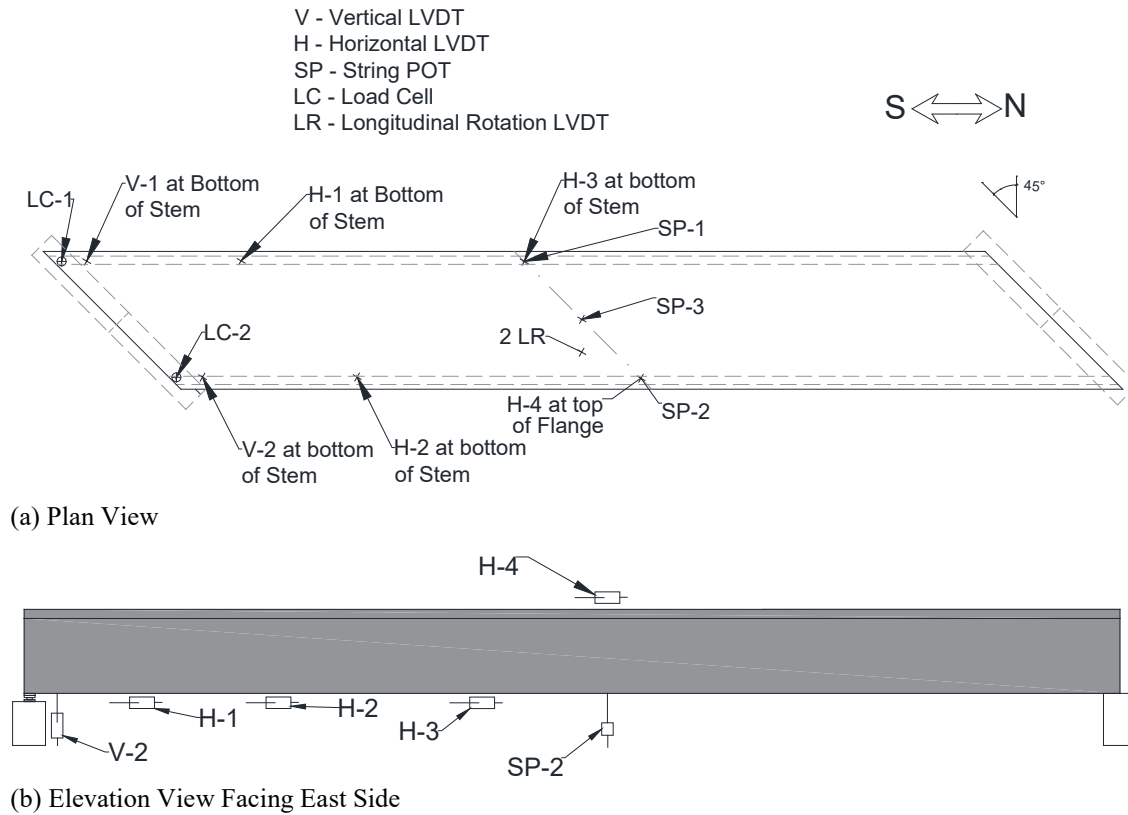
50-ft (15.24-m) Long Girder Instrumentation Plan including Displacement and Load Sensors
